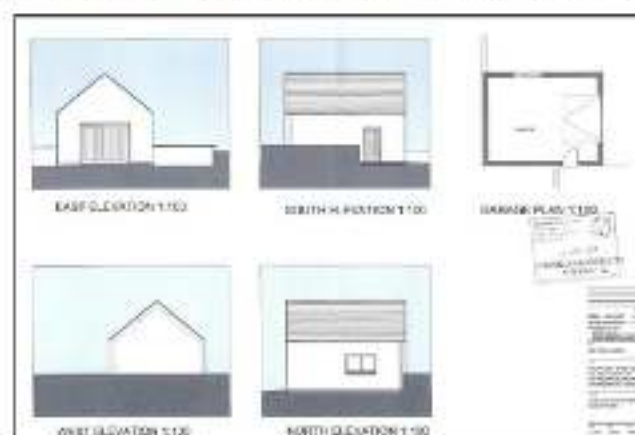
Extract from drawing P01 A illustrating the proposed curtilage extension and garage placement
